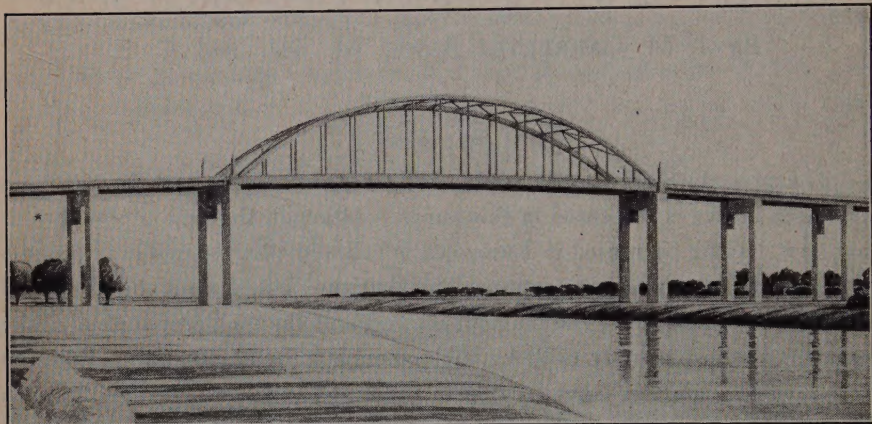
ST. GEORGES HIGHWAY BRIDGE
